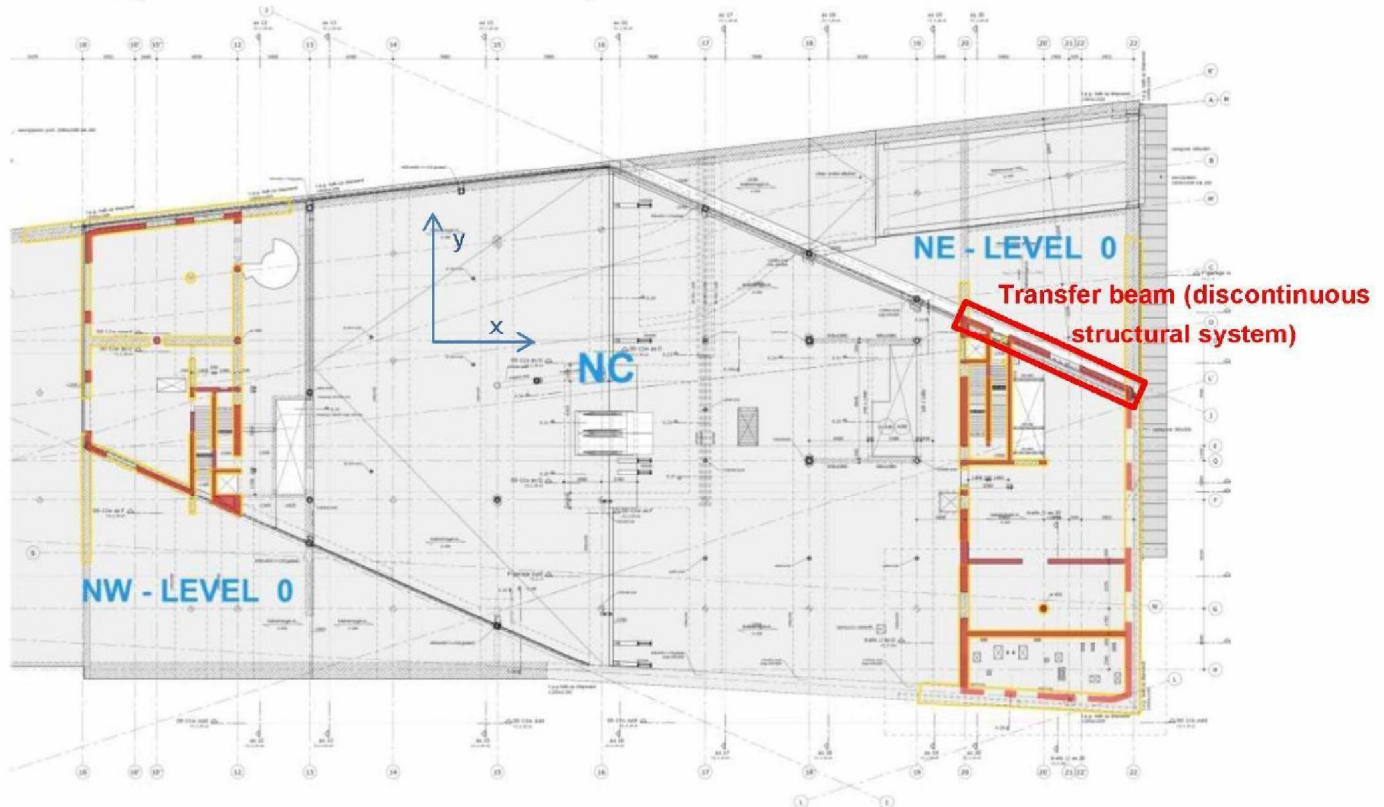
Plan view of ground level (red for the structural elements of the level, yellow for the structural elements below)
